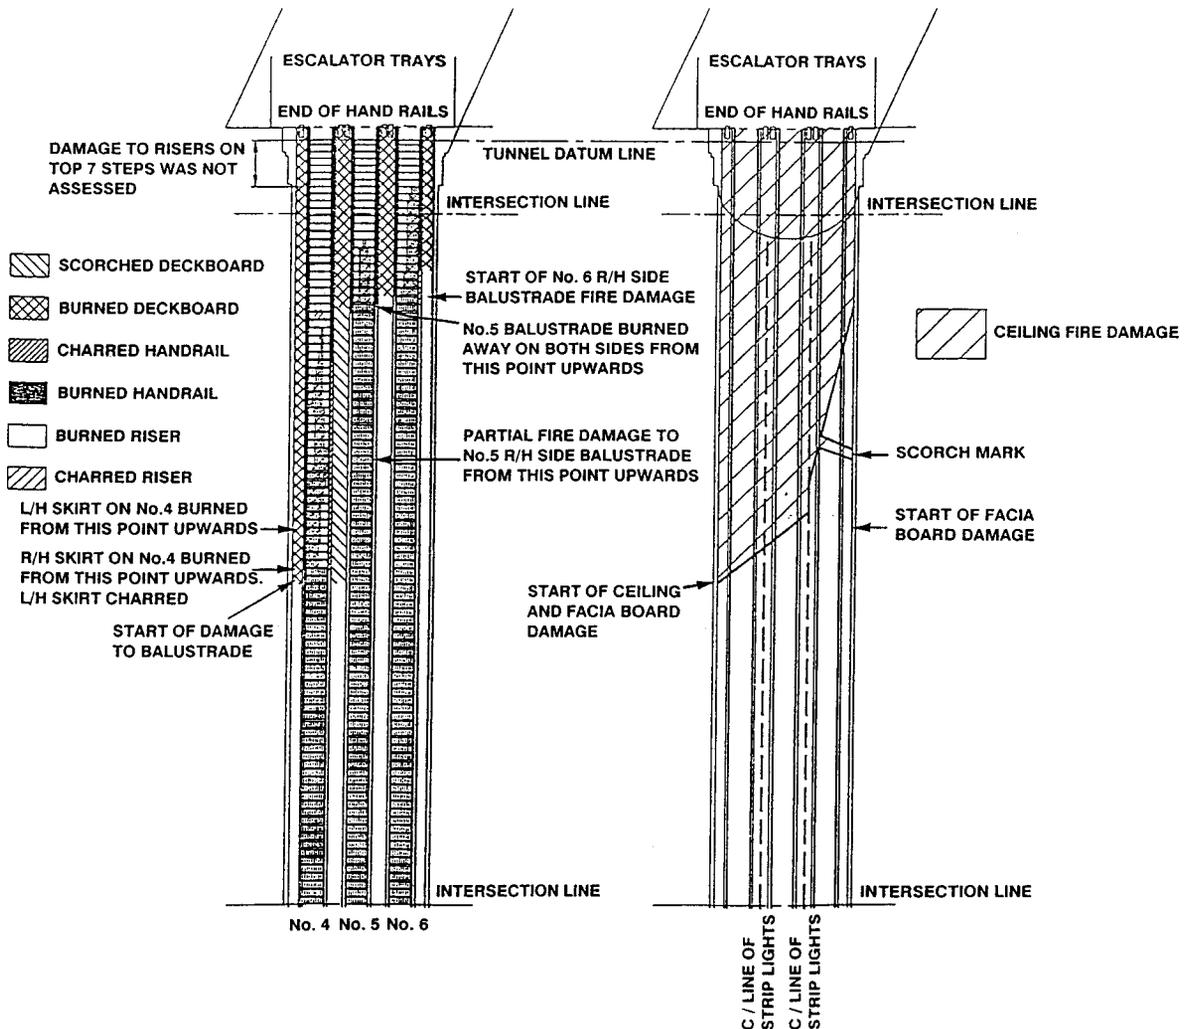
King's Cross Station Piccadilly Line fire damage, plan view.
